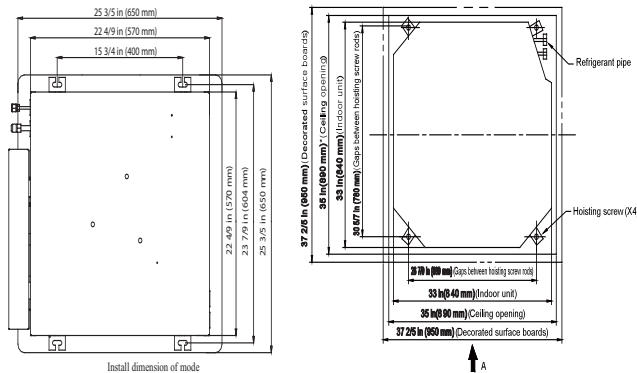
Dimension of ceiling opening and location of the hoisting screw (M10)
